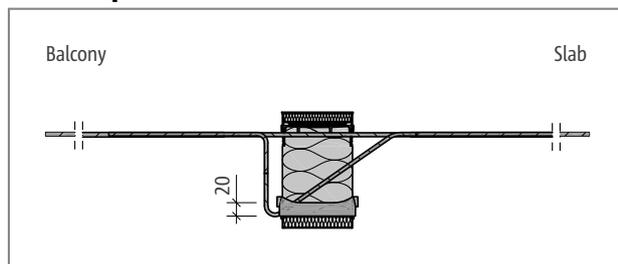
Schöck Isokorb® XT type K-M1 to M4: Product section
